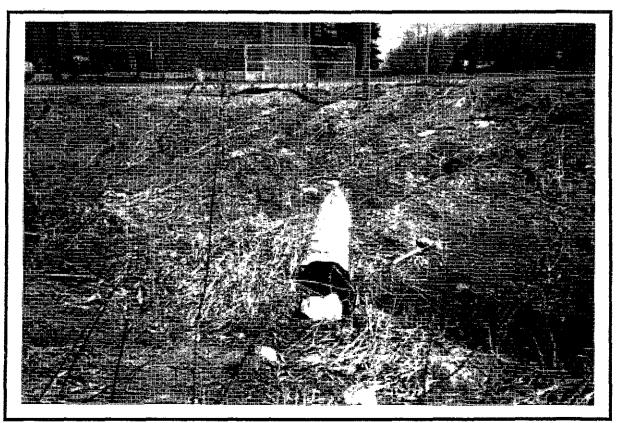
View of the outlet from the Northwest corner of Steeles Avenue and Sixth Line North.
